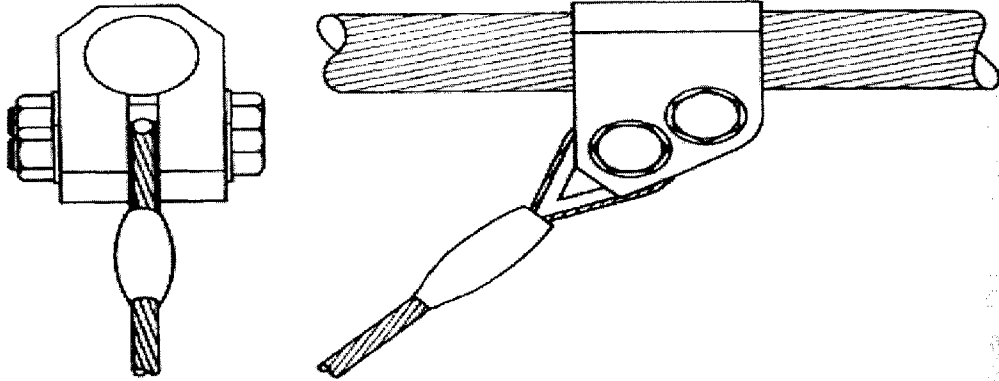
Detail showing clamp for connection of interior net cable to edge cable
